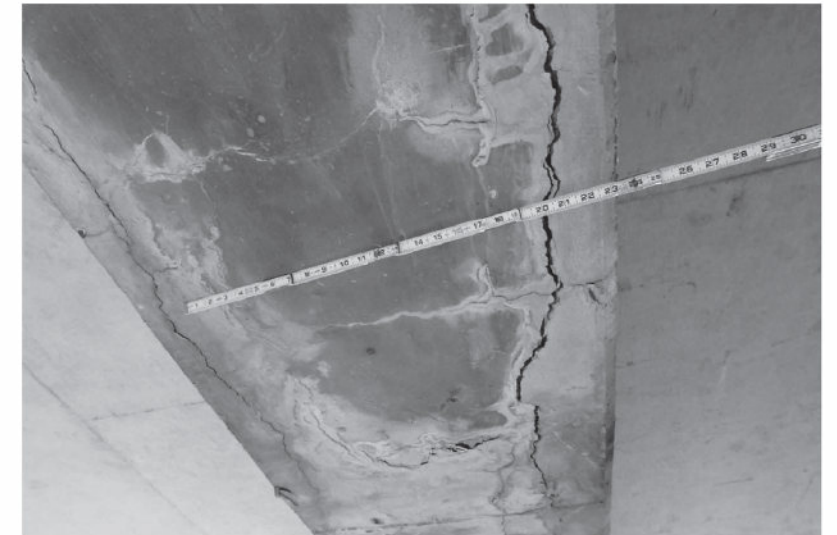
TYPICAL SIGNIFICANT DELAMINATION CRACKS IN BOTTOM OF BENT CAPS.
